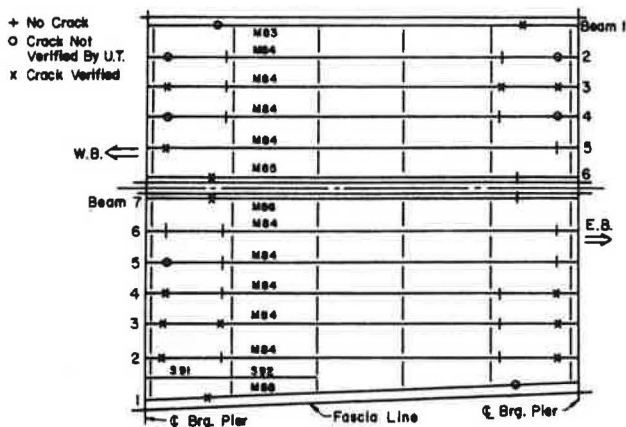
Plan of inspected details in span 10 Yellow Mill Pond Bridge
